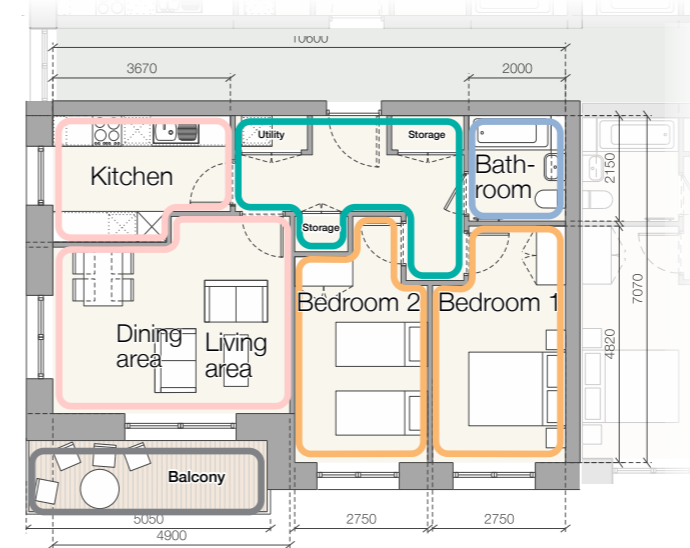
Typical separate kitchen, living, dining layout as shown to residents
